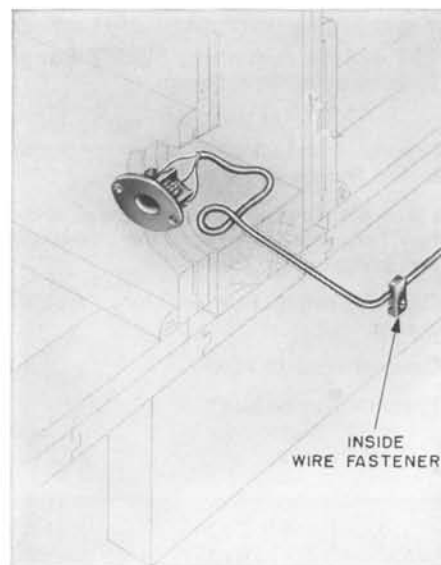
47B CONNECTING BLOCK MOUNTED IN BASEBOARD
